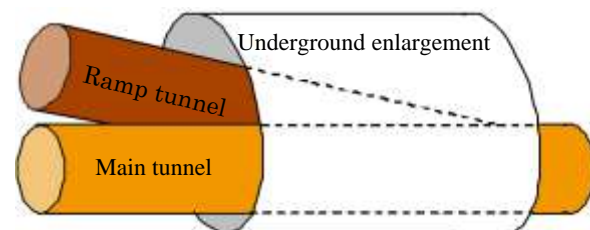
Underground enlargement around a main road tunnel and a ramp tunnel.
